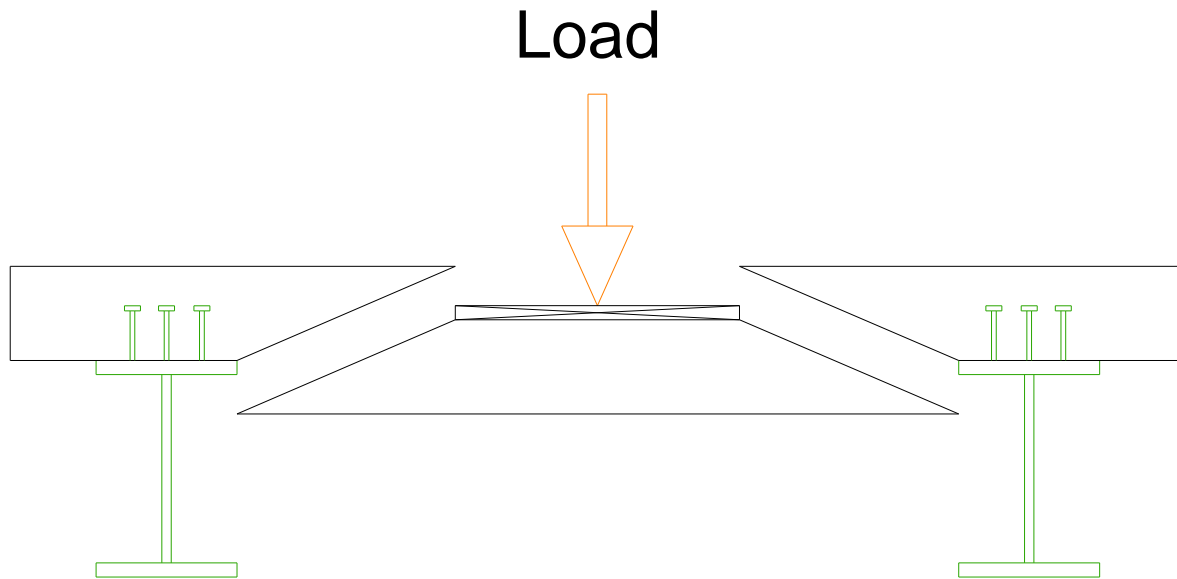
Punching shear failure in an empirically designed bridge deck slab under concentrated load
